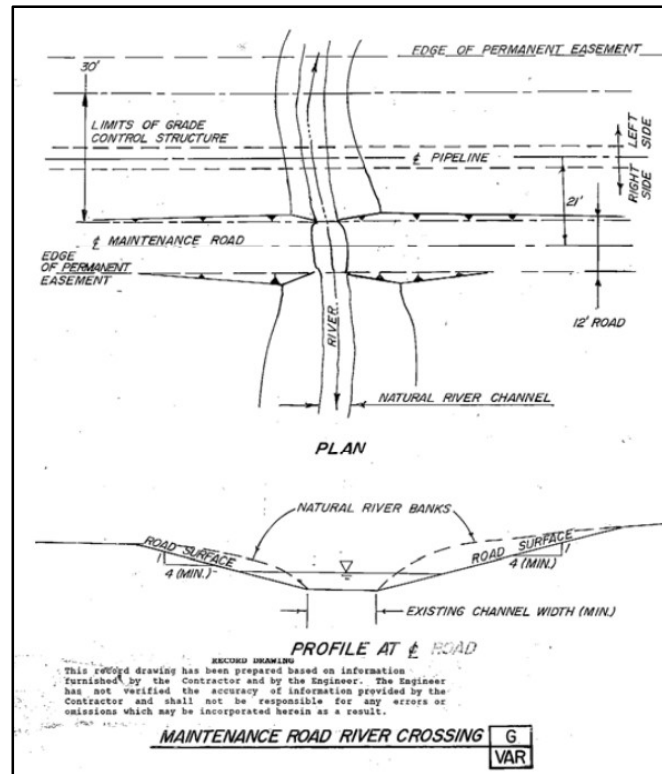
Maintenance Road River Crossing Standard Detail (AWWU 1986).
